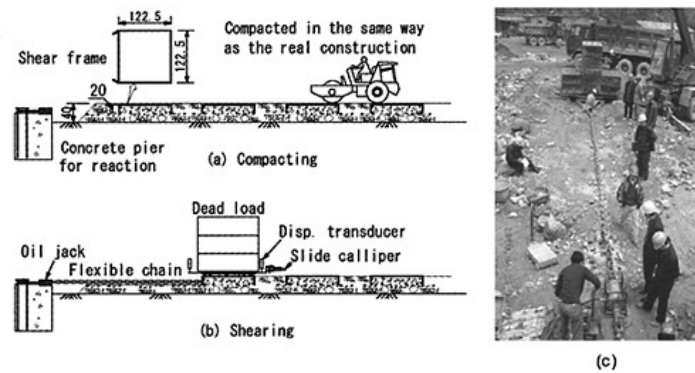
Schematic view and picture of the in-situ direct shear tests on rockfill materials at Yixing pumped storage power station construction site.
